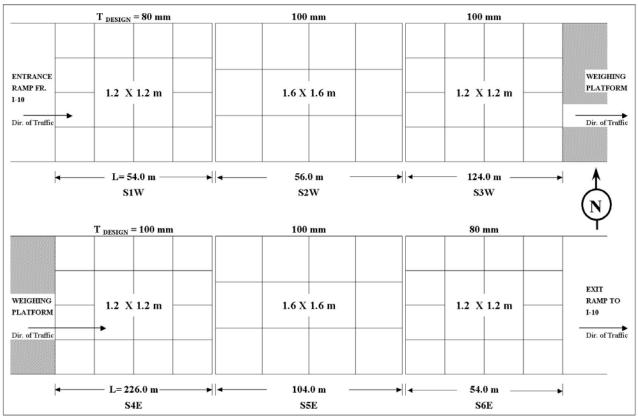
Design Layout of UTW at Ellaville Weigh Station
